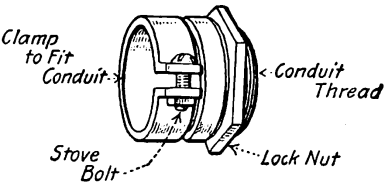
Connector for attaching flexible steel conduit to an outlet box.
